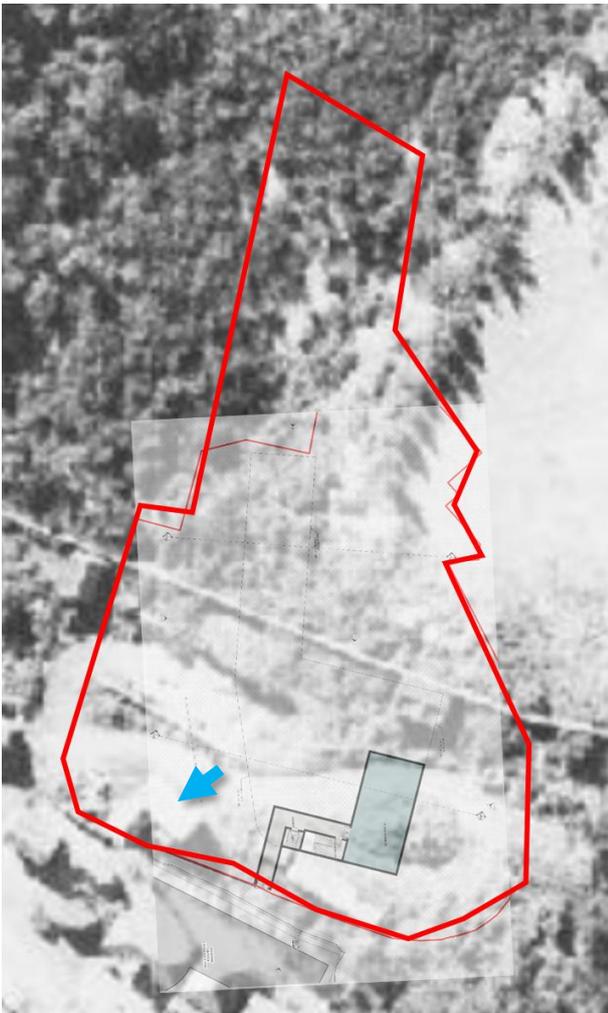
Overlay of first floor plan on 1961 aerial photograph. Note the former incinerator (indicated with arrow) located to the west of the proposed excavation works.
